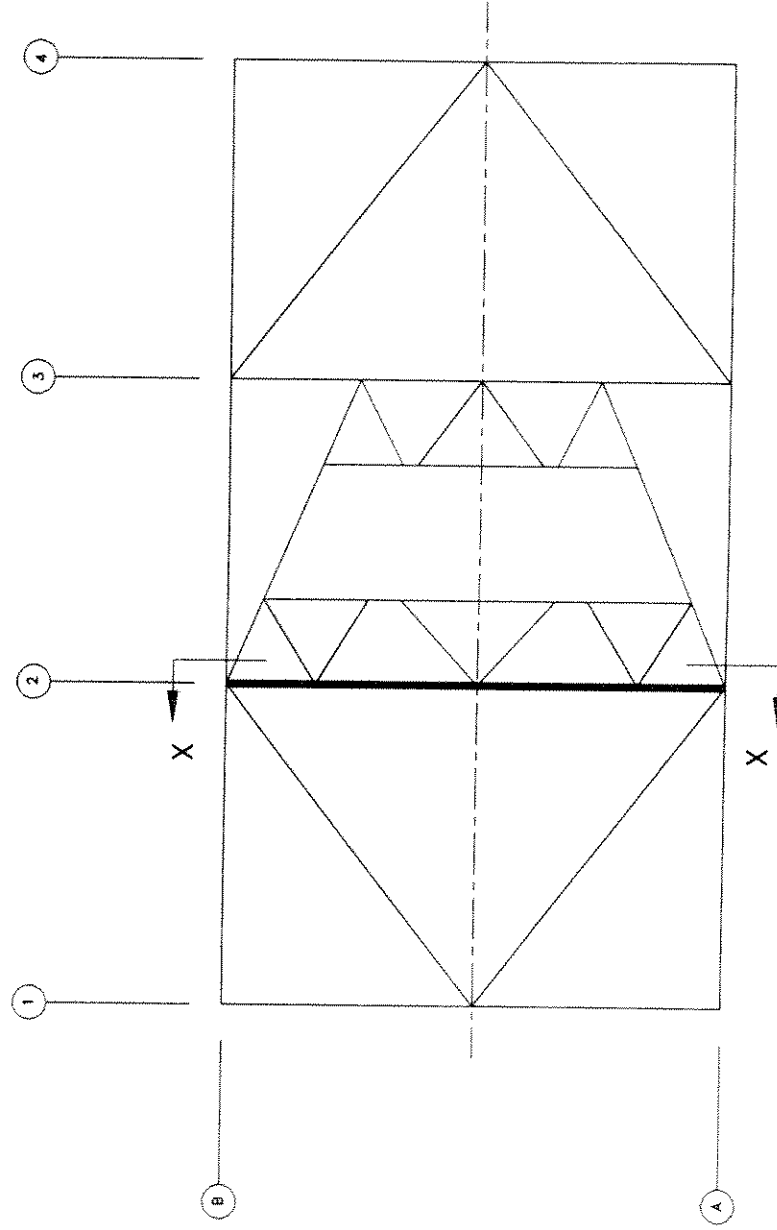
PLAN AT ELEVATION -12m LEVEL
